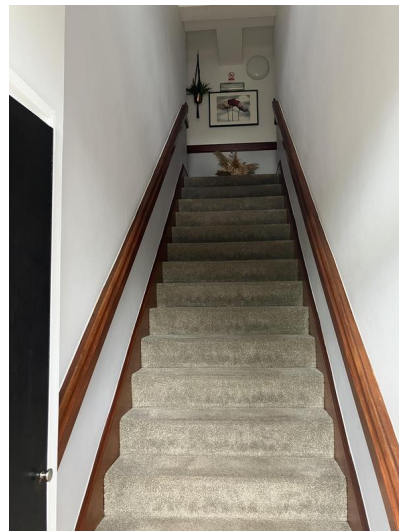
No fire safety information to Block 12-14 or 18-19.
